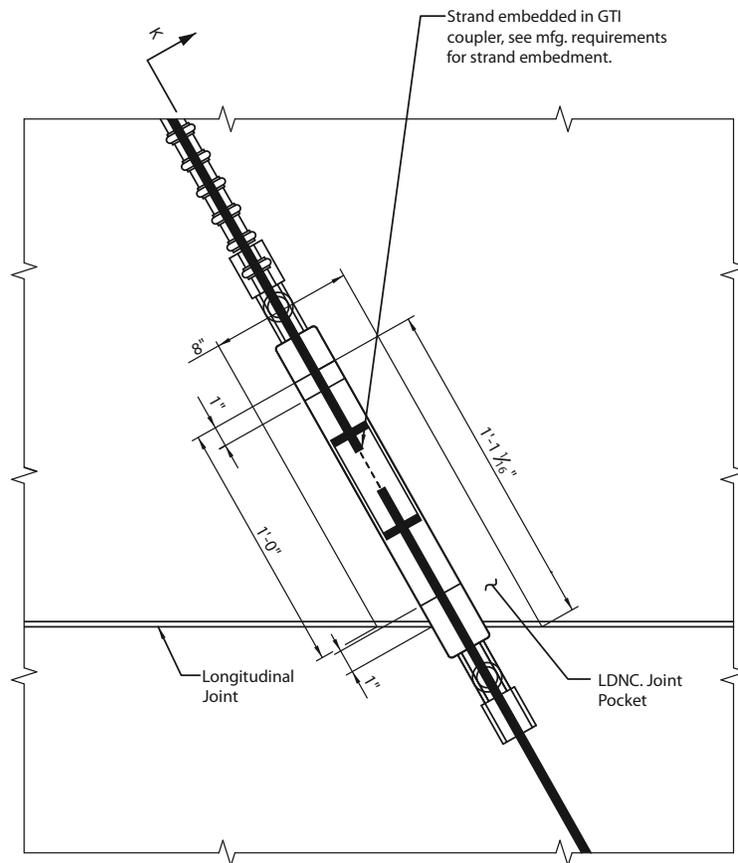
Plan view of longitudinal joint post-tensioning detail.
